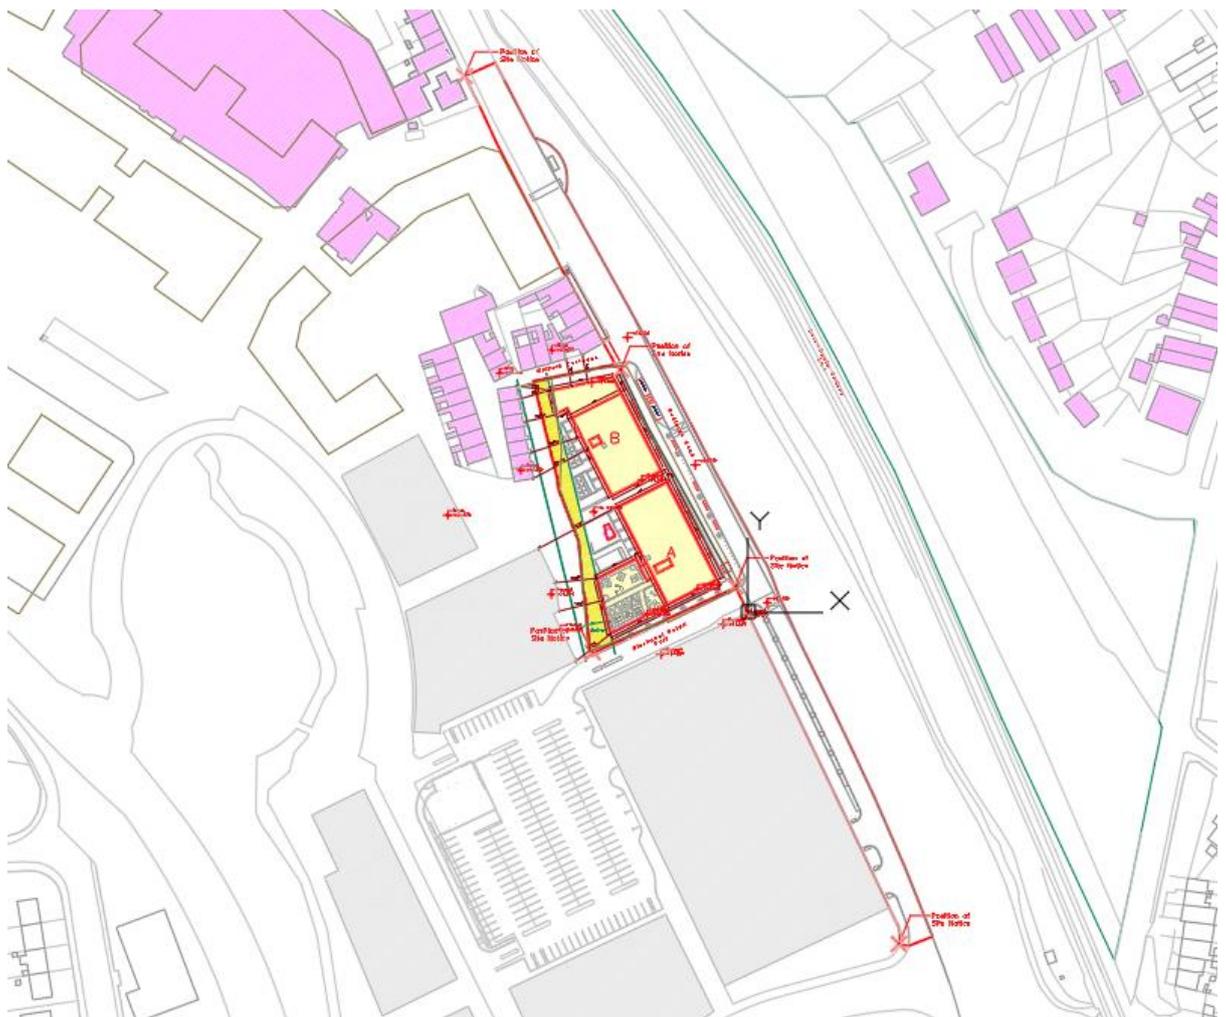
Proposed Development Site Layout- Ground Floor (Retail). (Butler\Cammoranesi)
